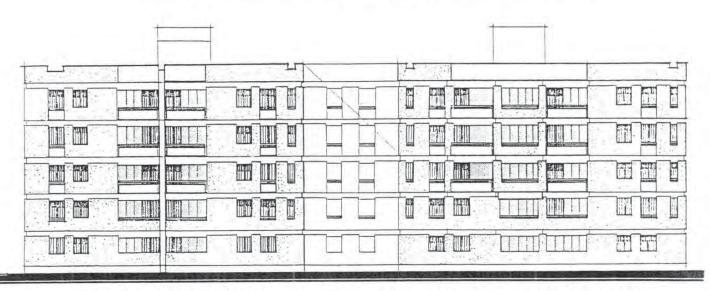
Facade Study - Direct Access Walk Ups, Surveying Dept Staff Housing Coop, Helwan Gardens, Egypt
